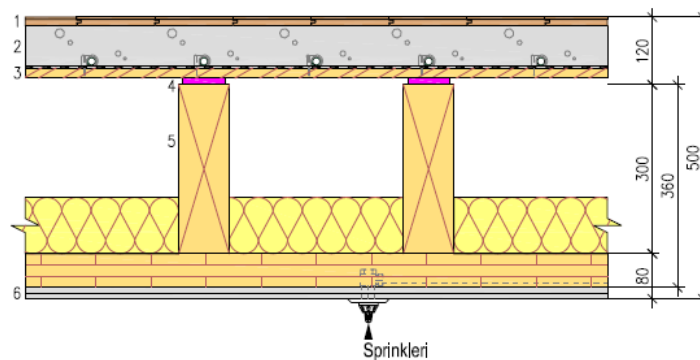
Build-up of intermediate floor type VP801KRL, RunkoPES 2.0.
